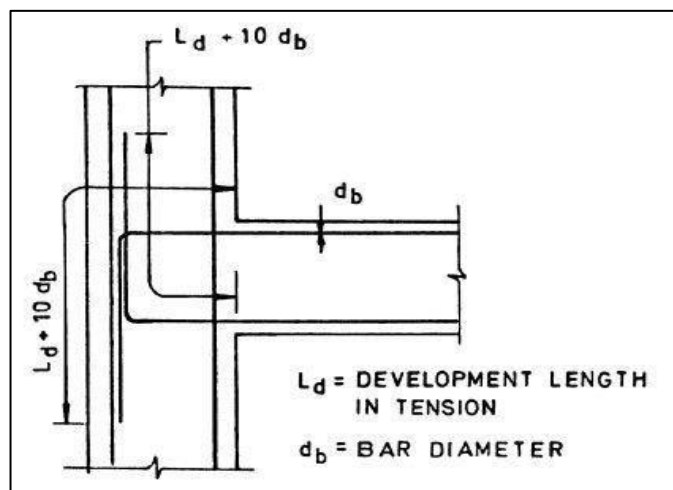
Anchorage of Beam Bars in an External Joint, IS 13920(2002)
